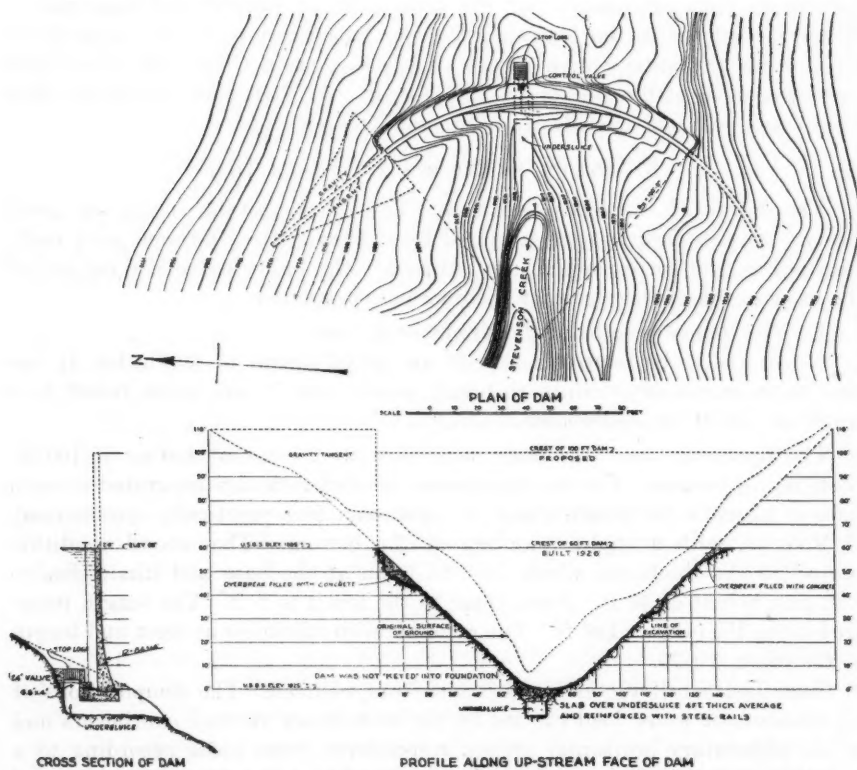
PLAN, PROFILE, AND CROSS-SECTION, STEVENSON CREEK TEST DAM.
